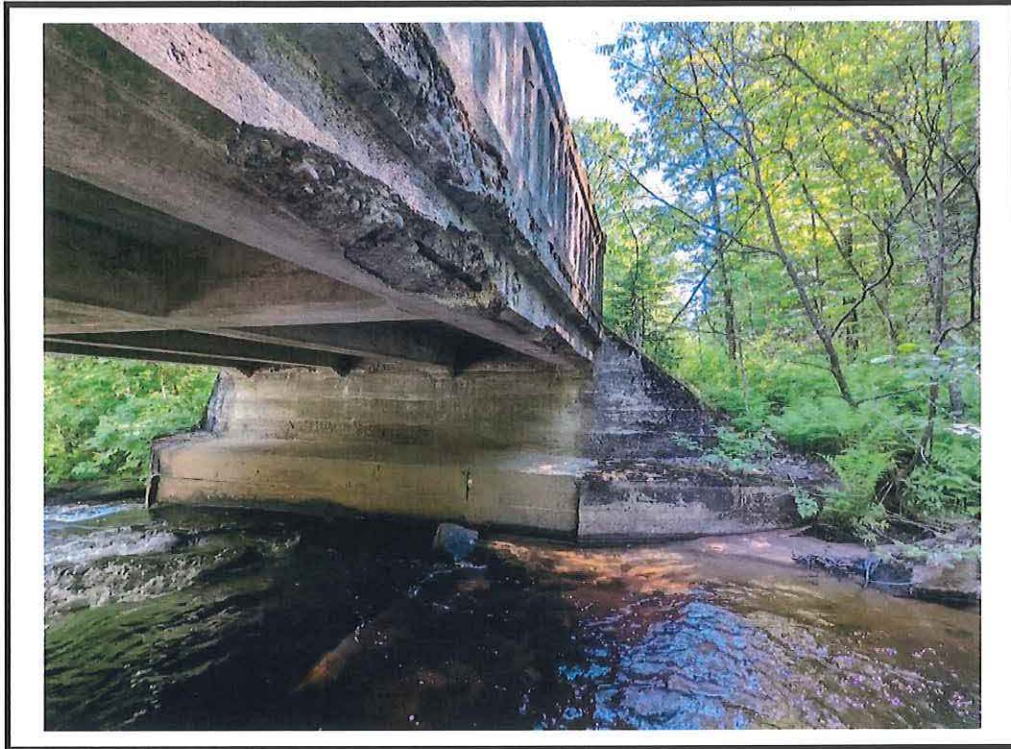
Spalls with exposed corroded reinforcement on face of exterior girder
